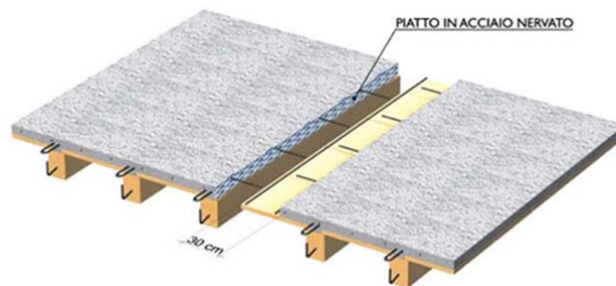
transversal joint performed by casting of a 30 cm width topping concrete (Wood Beton)
